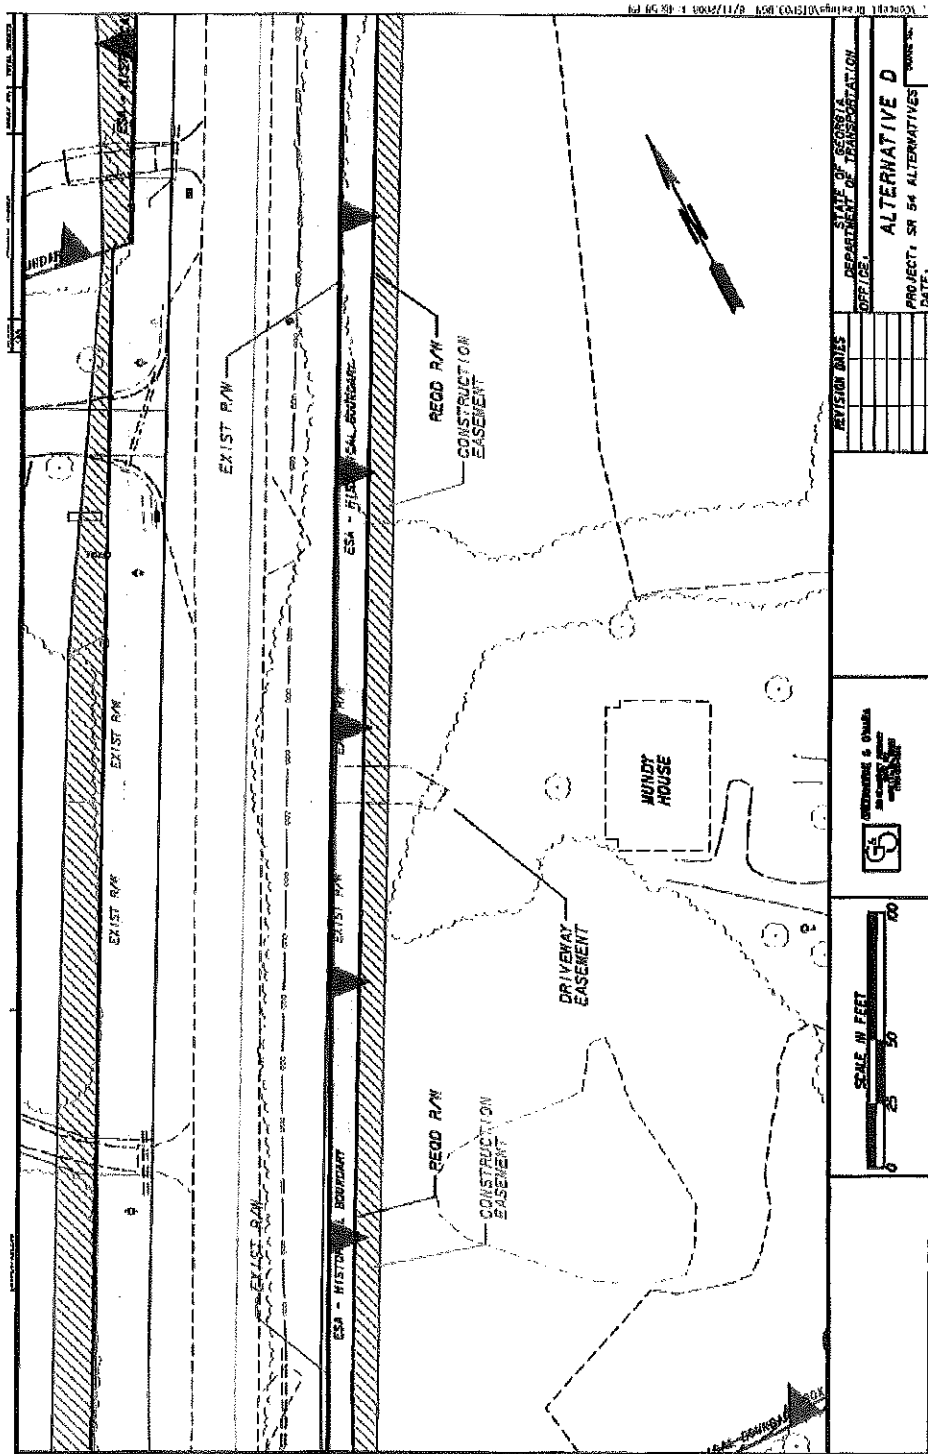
Mundy House Site Impact for Minimization Alternative ‘D’ (1)
